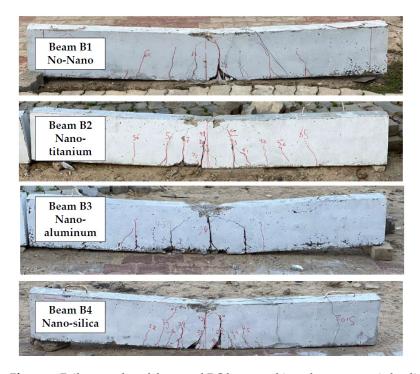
Failure modes of the tested RC beams subjected to monotonic loading.
